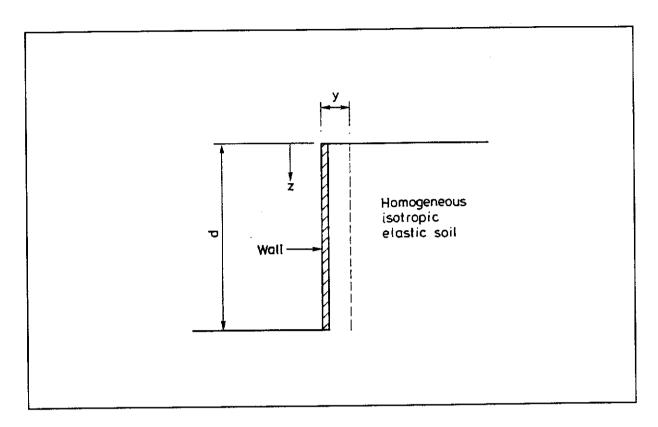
Translating Wall Problem Considered by Finn (1963)
